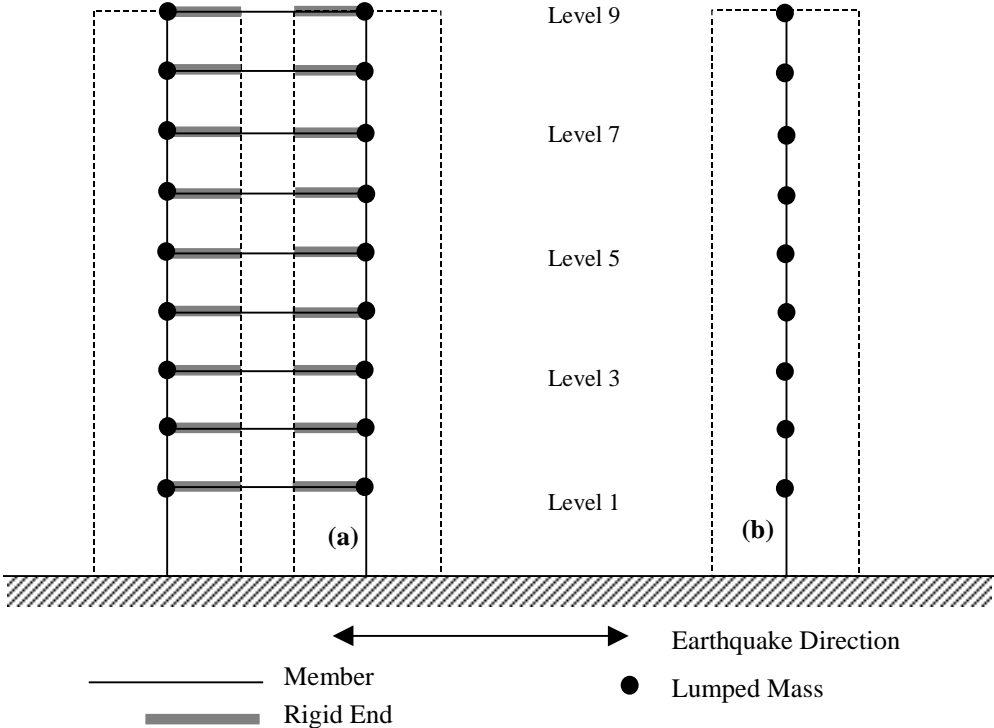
The Model Analysed (a) Coupled wall Model (b) Cantilever wall Model
